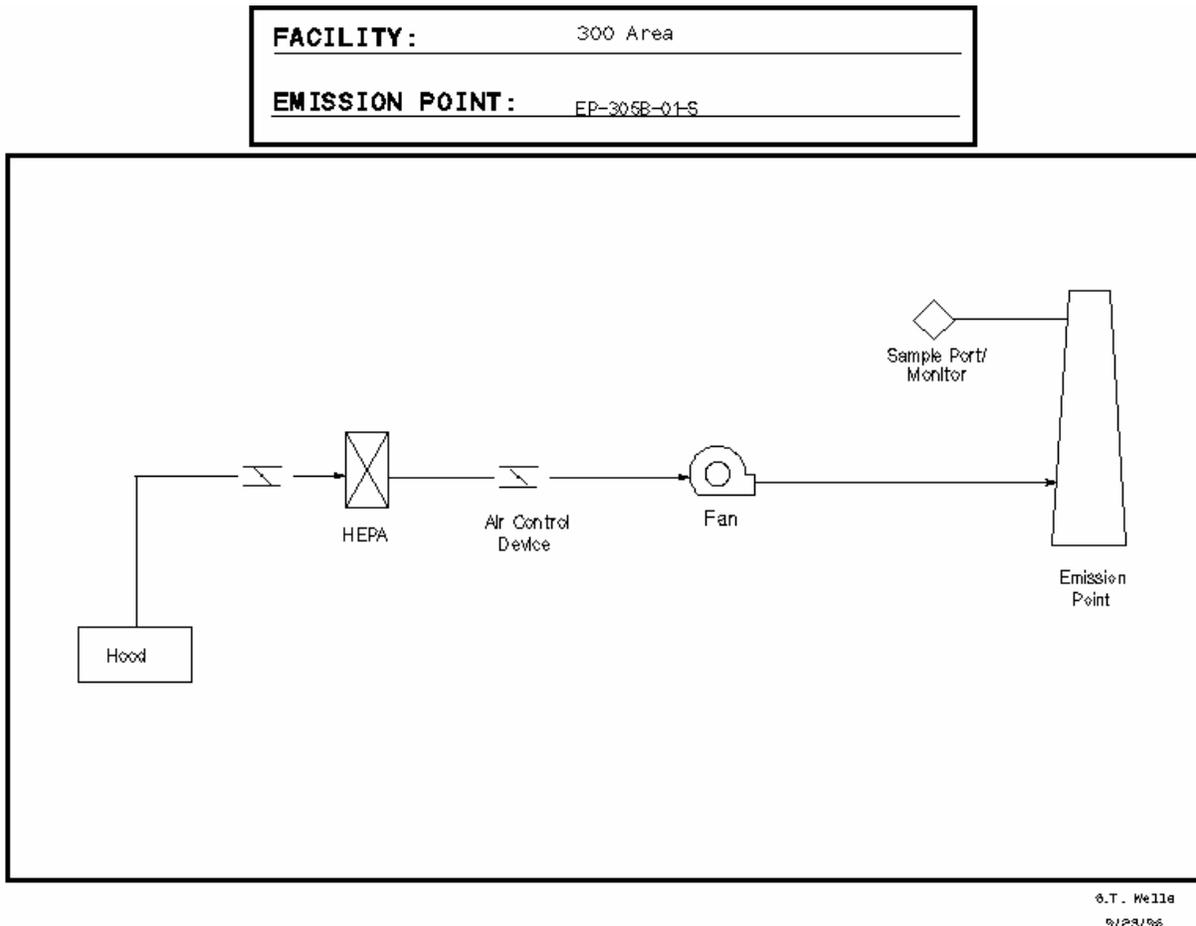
305-B Building Simplified Ventilation System Drawing
